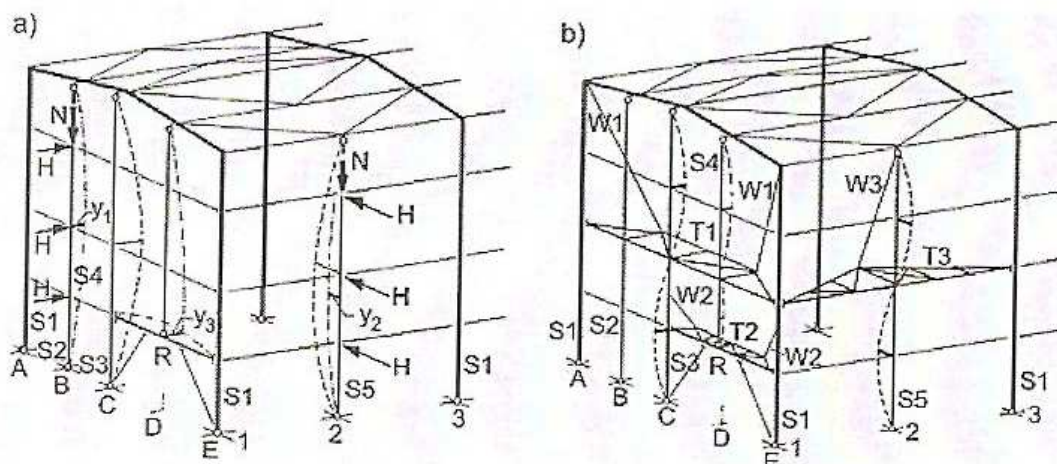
Possible deformations and the effect of wind horizontal bracings: S1- main column, S2-S5- secondary columns, T1- T2- horizontal wind bracings, W1-W3- suspension members
